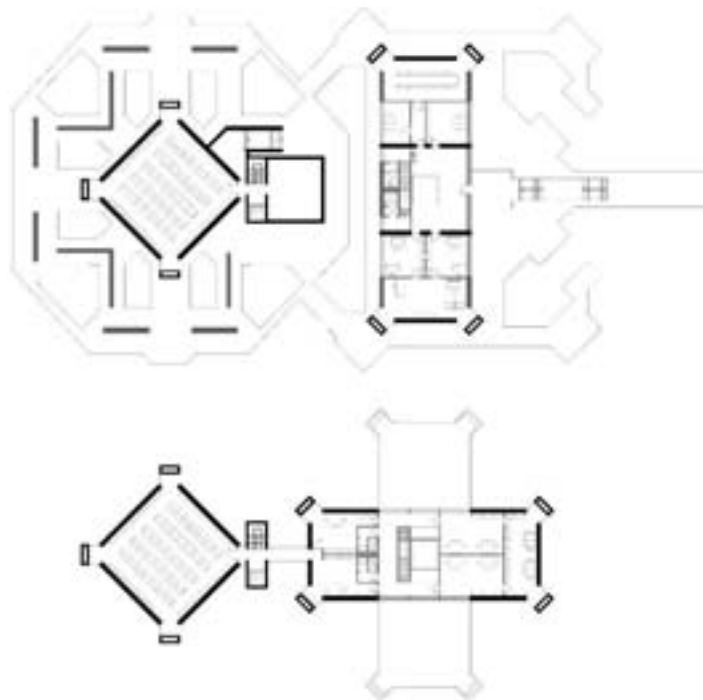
Georgi Konstantinovski (1966-1968). Archive in Skopje: Ground floor plan and First floor plan.
